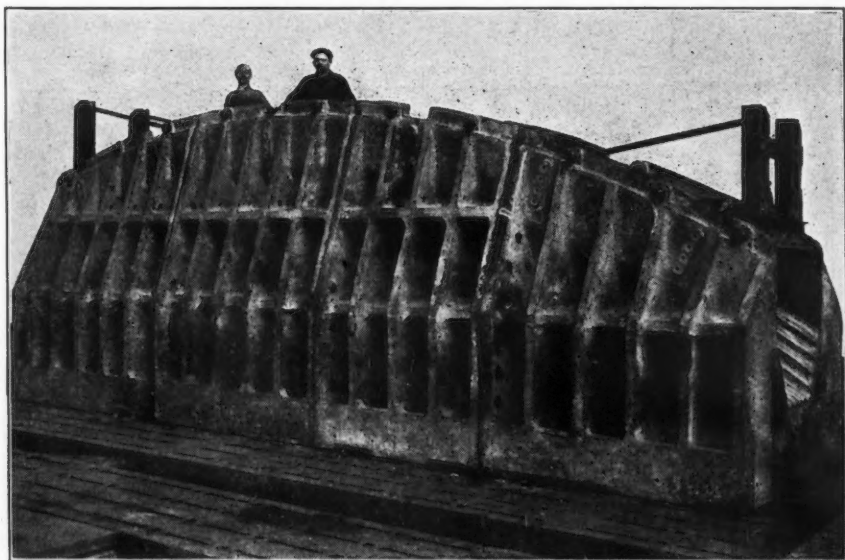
VIEW OF MAIN TOWER SADDLE.
